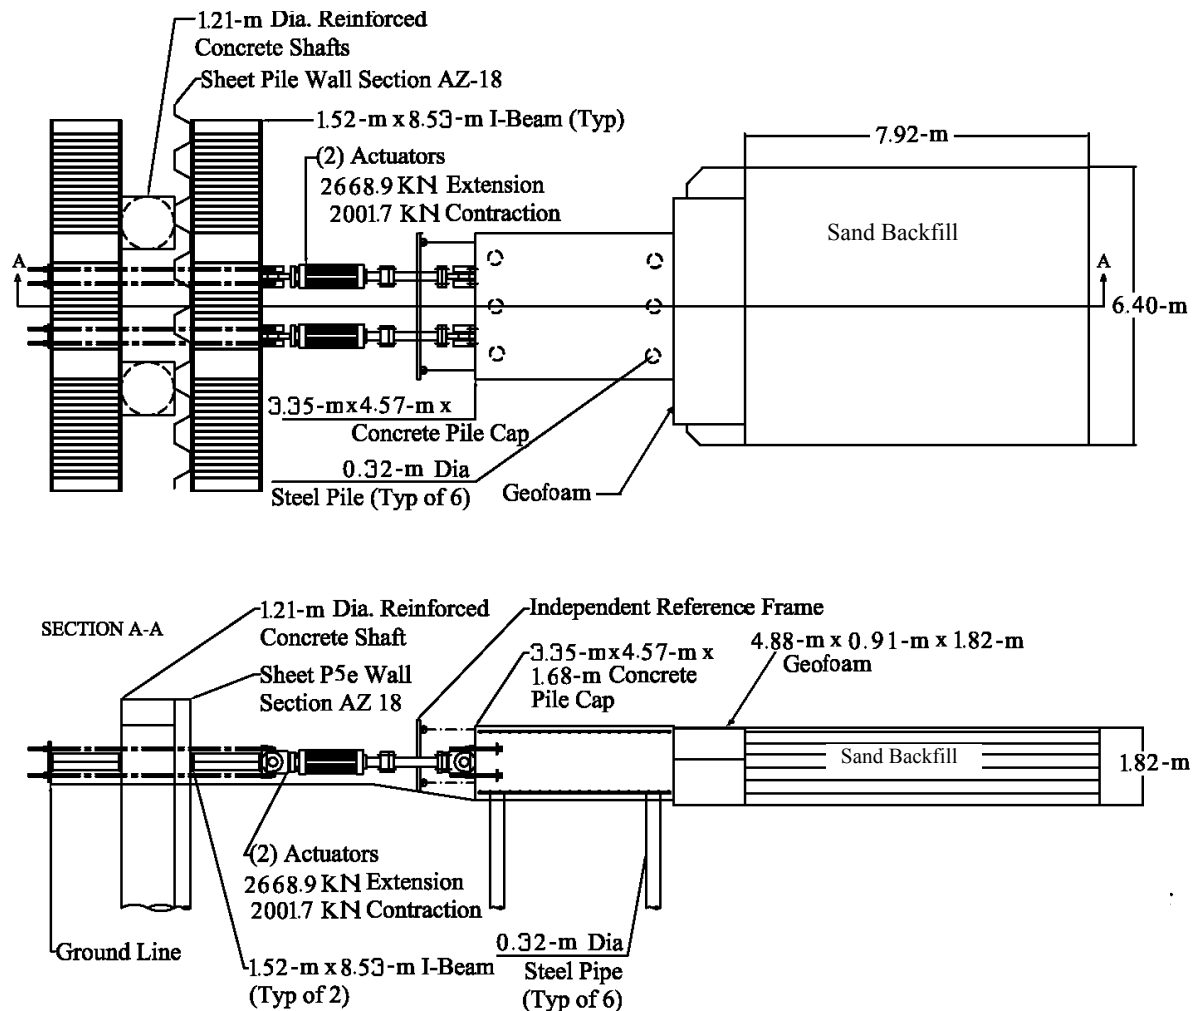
Plan and profile views of the test set-up showing test pile cap, geofoam inclusion, and backfill soil along with the loading system.
